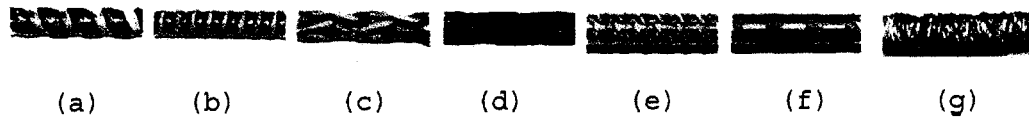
Types of surface deformation on FRP rebar for improvement of bond to concrete: (a) spiral indentation; (b) deformed; (c) braided rod; (d) multiple twisted strands; (e) deformed; (f) helically indented; (g) sand coated. [5]
